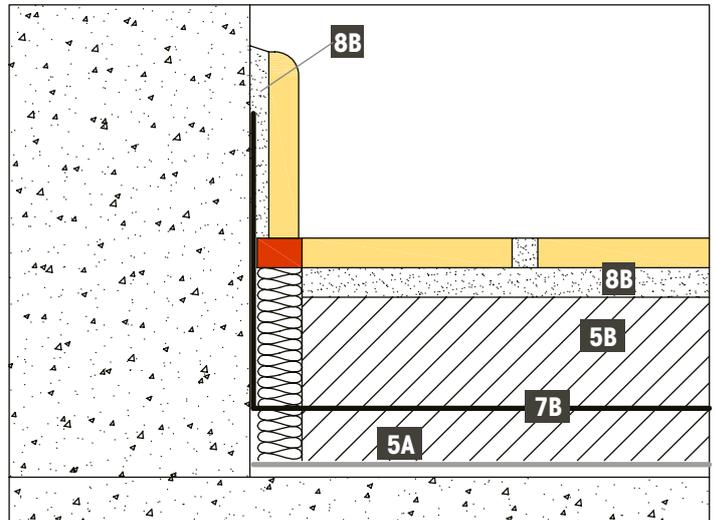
Option B conventional with a waterproofing sheet such as asphalt or similar.
